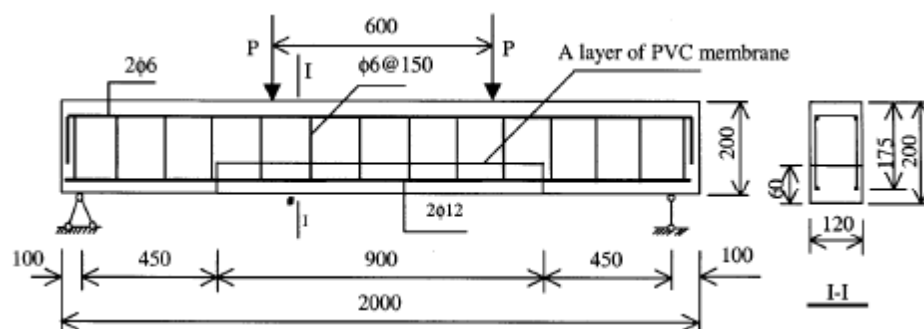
Details of Short-term Test Specimens (Xiong, Liu and Xie 2000).
